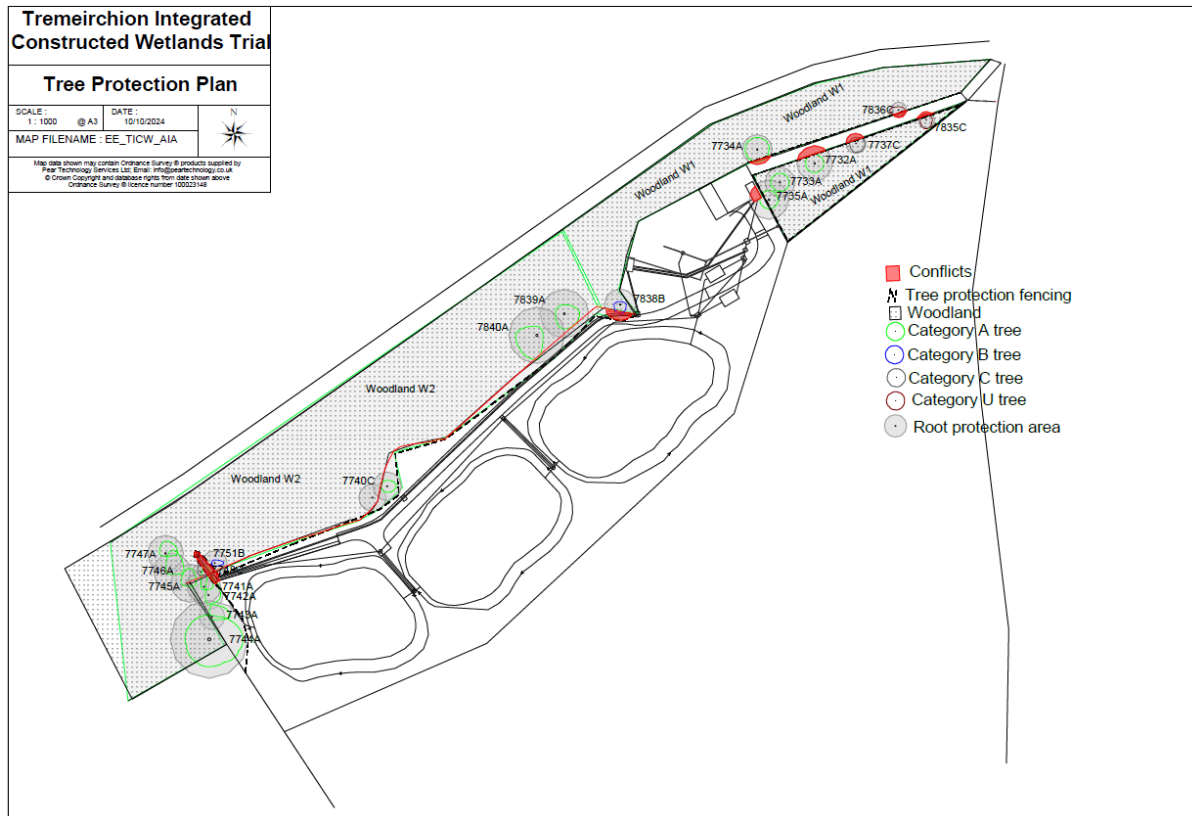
Tree Protection Plan for the Tremeirchion wetland site
